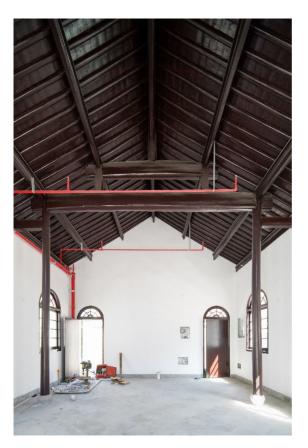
The traditional Chinese roof-truss system of the Xiaguan Catholic Church.
